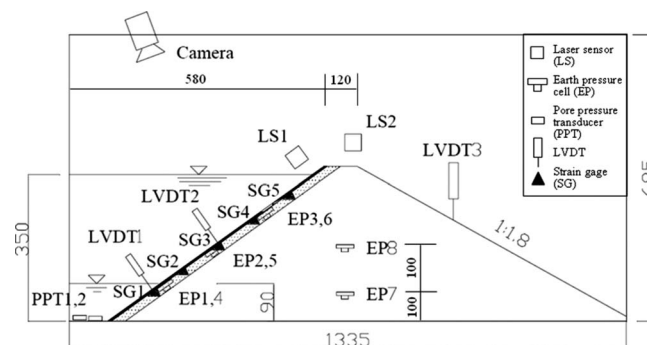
Instrumentation layout of Model 1 (units: mm)
